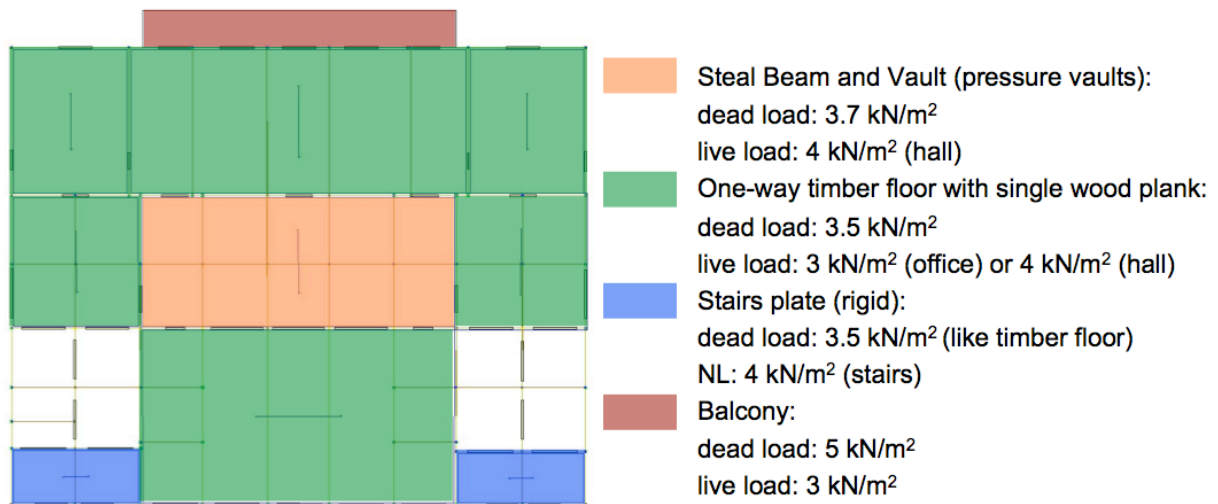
Second floor on first floor (2.OG on 1.OG)
